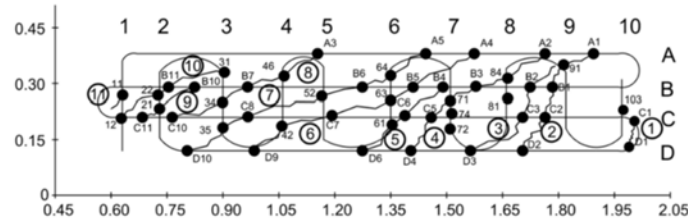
Shear cracking pattern of beam I-3 at 258 kN.
